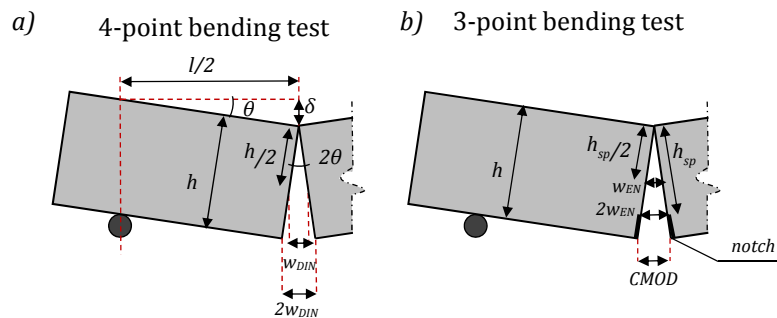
Failure mechanism of a) 4-point bending test (unnotched specimen) and b) 3-point bending test (notched specimen).
